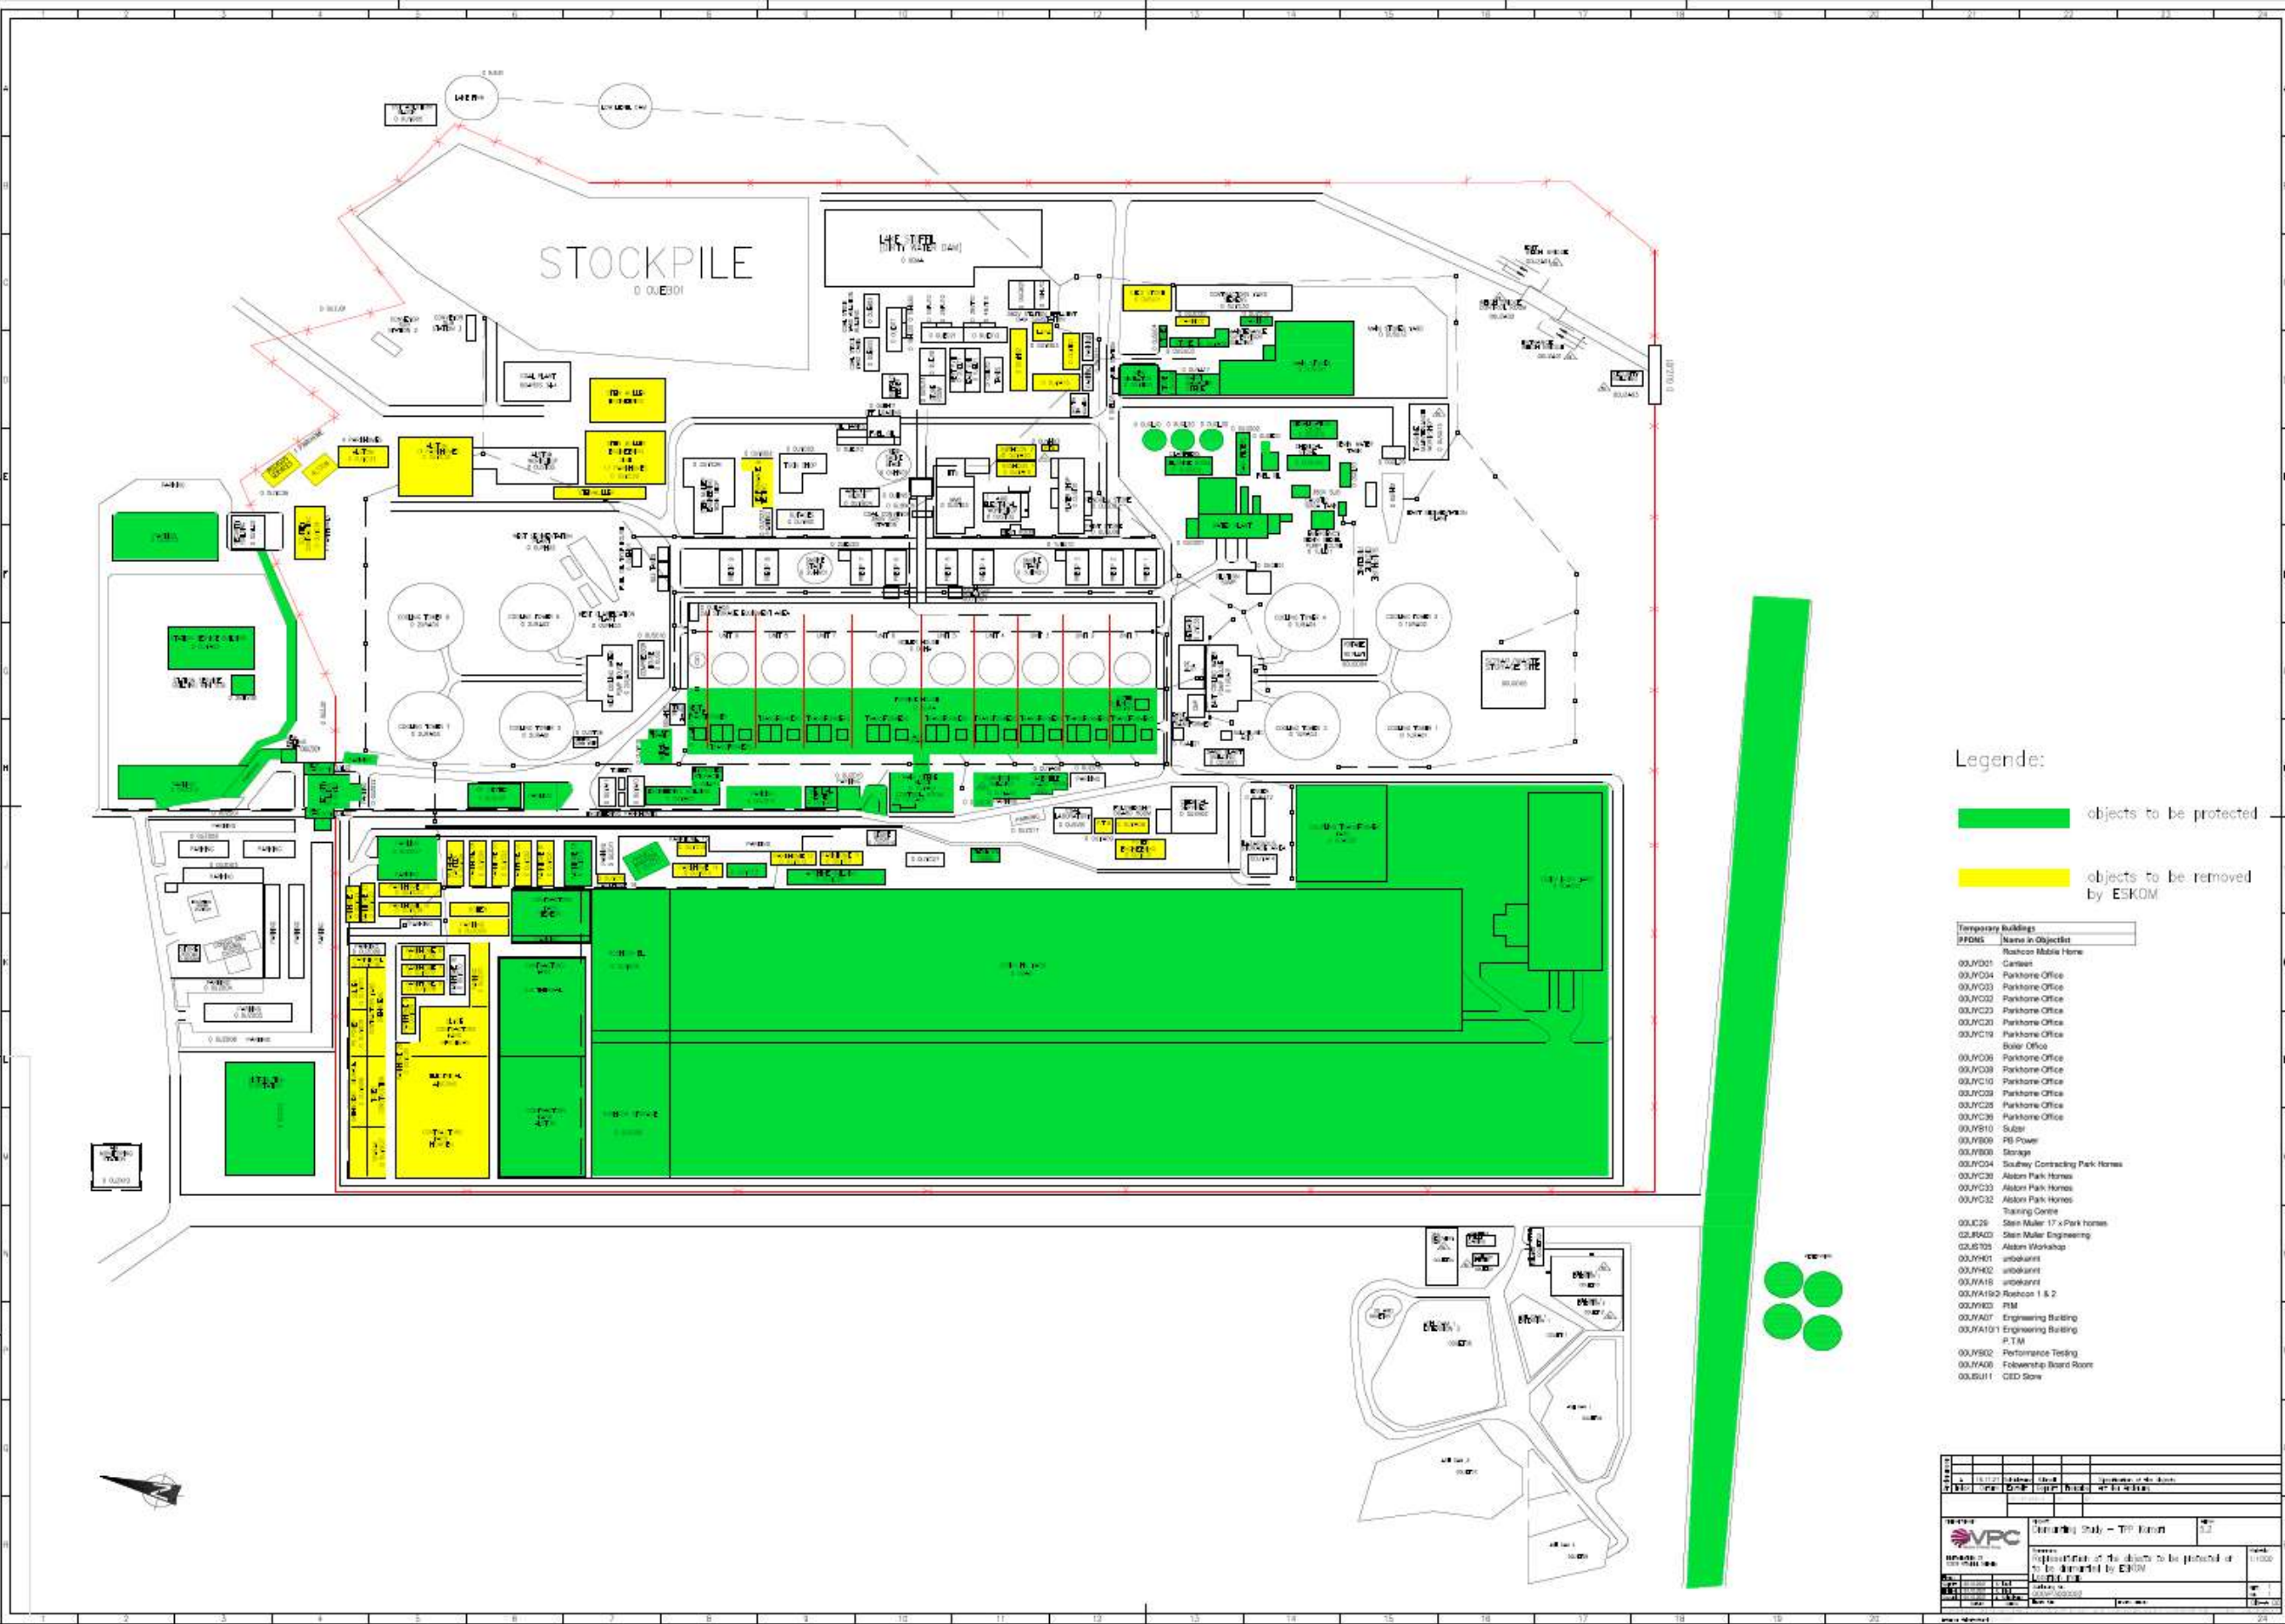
Temporary Structures, Plant and Buildings to demolish and structures to be retained (WBG, 2022)
